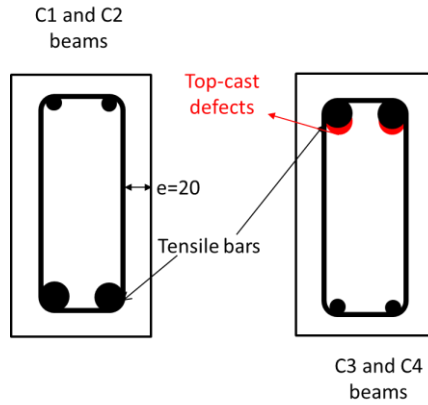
Location of top-casting-induced defects on C3 and C4 beams
